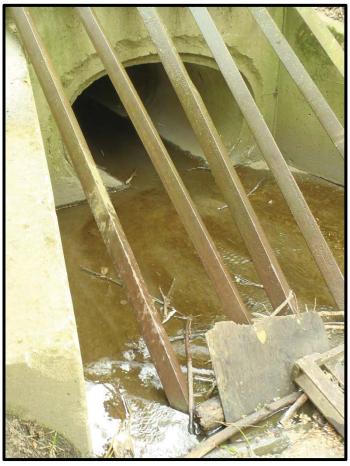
Stream 1 culvert inlet near Structure 16. This stream has been culverted and buried along the line until Structure 6. Image taken looking east on May 7, 2013.
